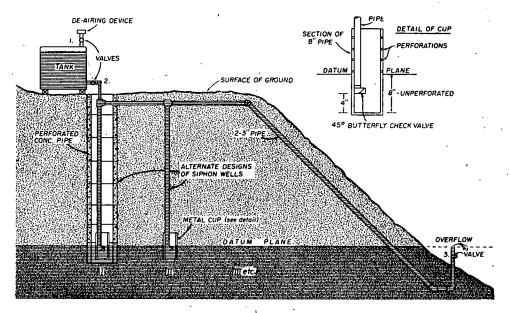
The Washington siphon. This system of vertical collector pipes and siphon arrangement has been successfully used by the State Highway Commission of Washington for lowering the water level and stabilizing landslides.
